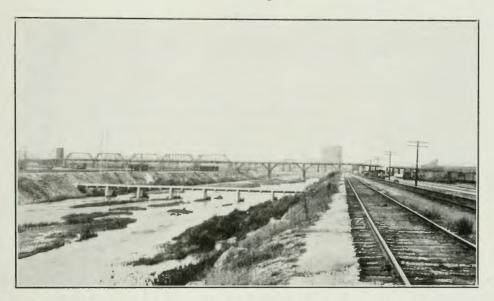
LOS ANGELES RAILWAY BRIDGE ACROSS THE LOS ANGELES RIVER
